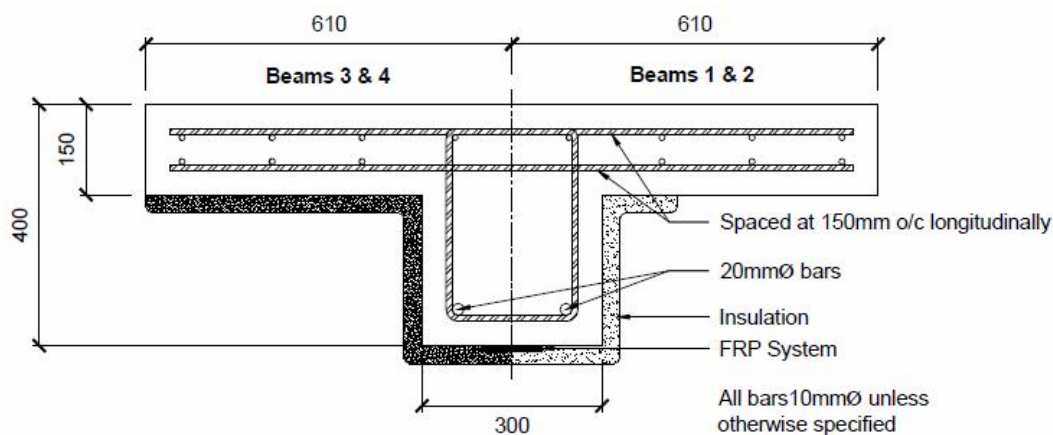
Cross-Sectional dimension of the T-beams tested by Benichou et al (2008)
